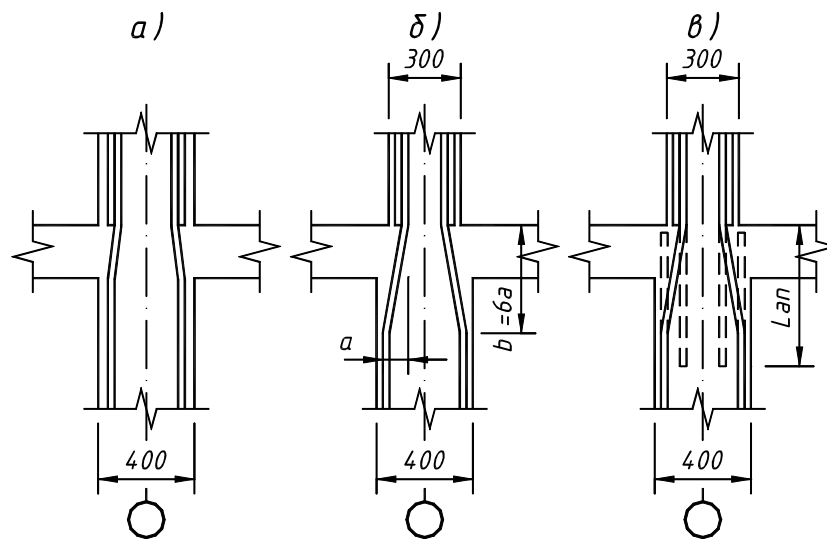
Diagram of intersection of the longitudinal bars of the column with reinforcement bars in top of slab (transverse reinforcement of columns, reinforcement of the floor slab is not shown):
